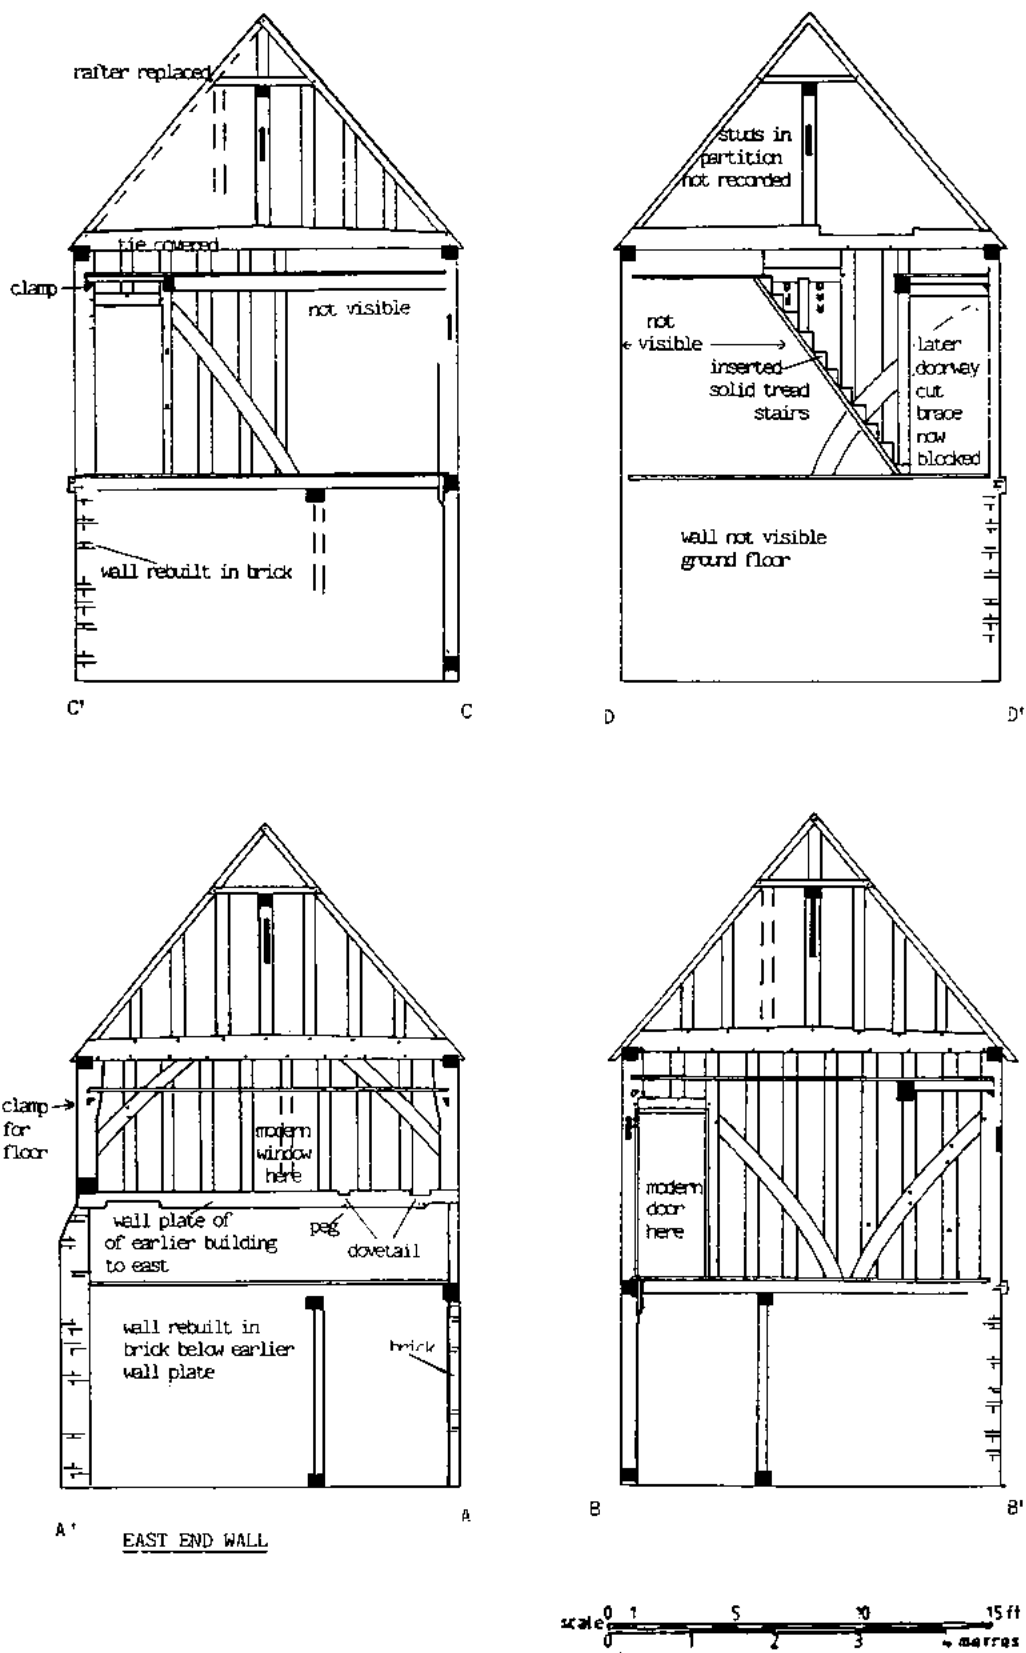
Sections through the Lodging Range, Newland Hall, Roxwell.
